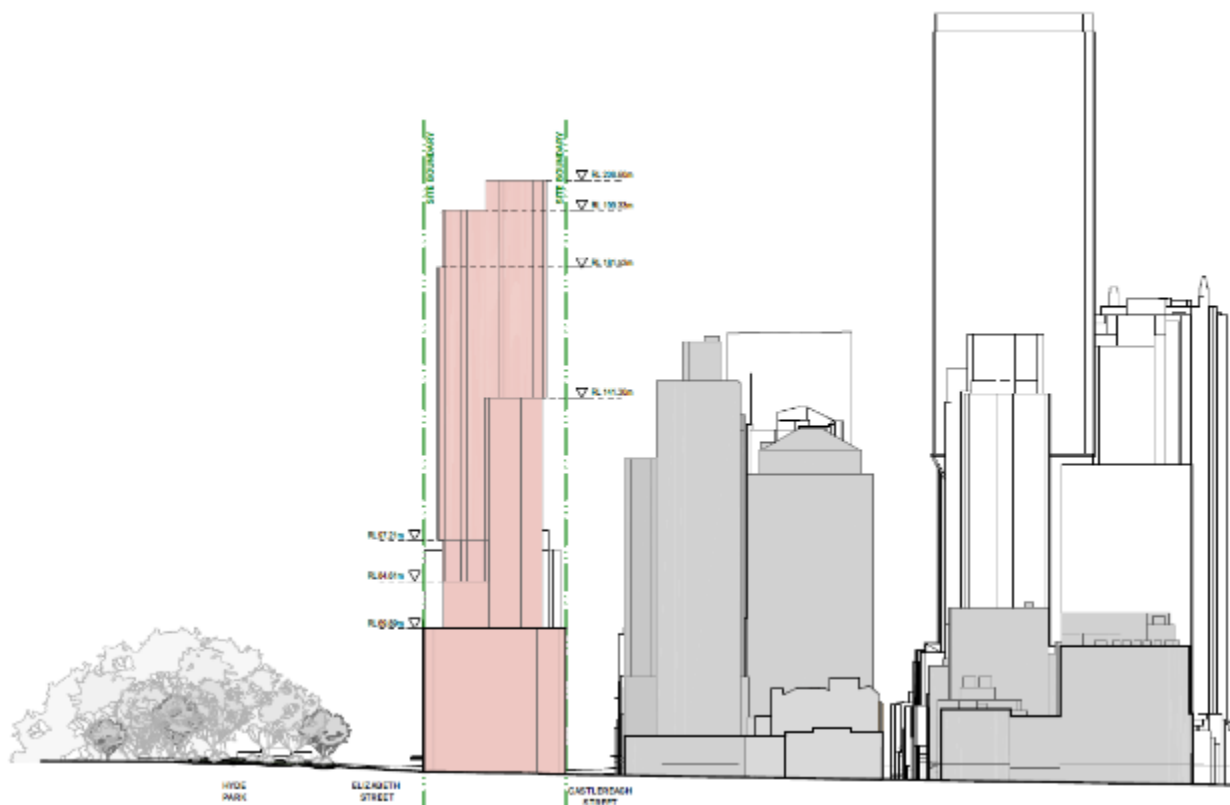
| Proposed north elevation – Park Street (Source: Ethos Urban modification plans)
